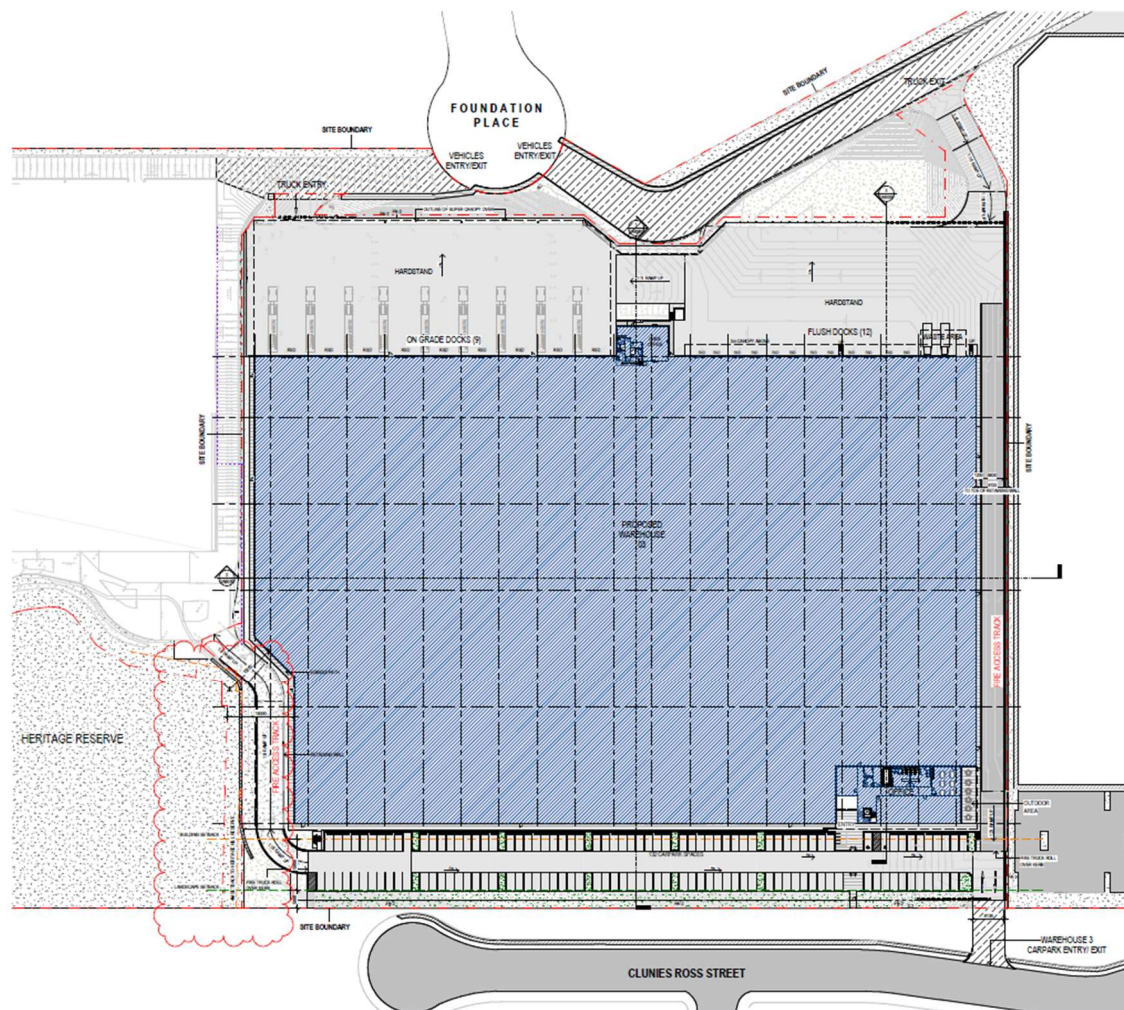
Proposed Warehouse 3 Site Plan (Source: Watson Young)
